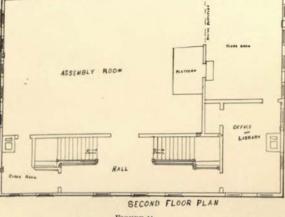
Underwood School Building-Second Floor Plan. For building see figure 1,
